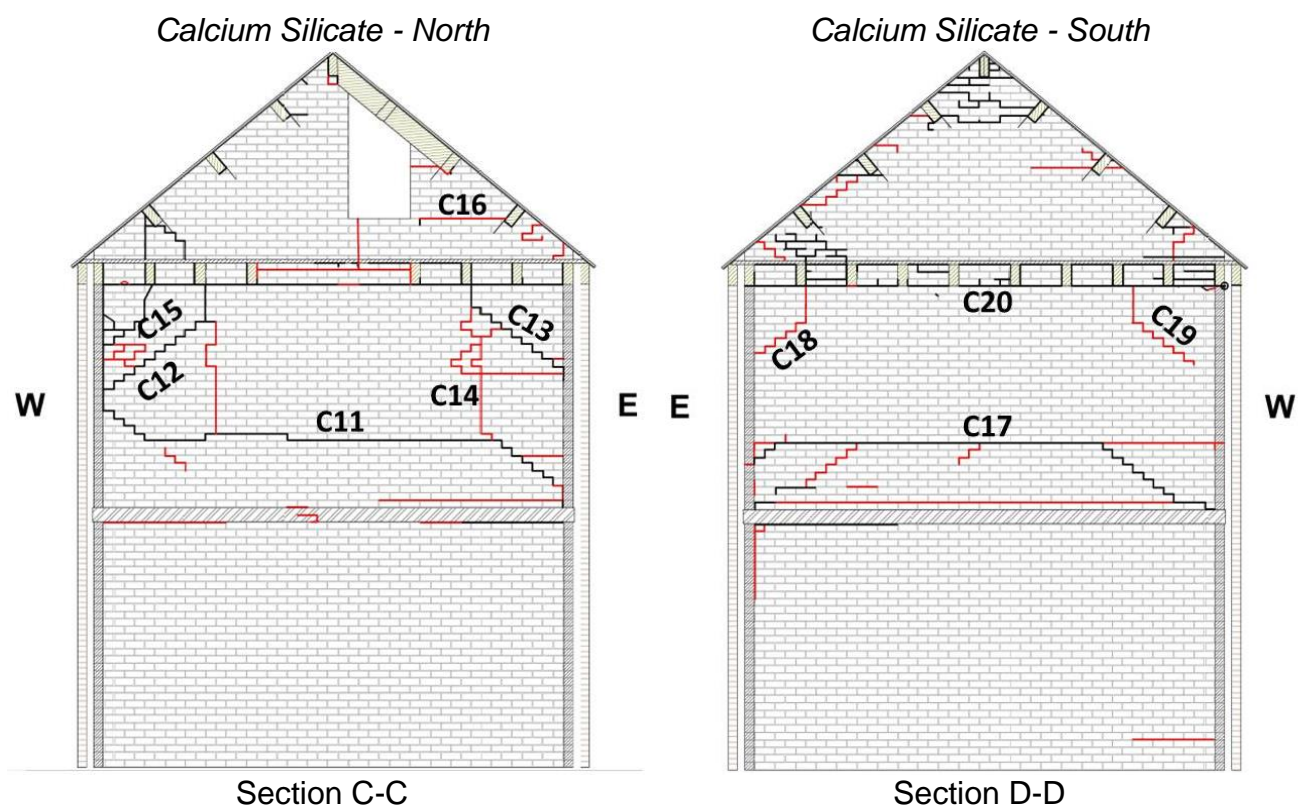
EQ-NPR 100% cracks - Calcium silicate transversal walls.
